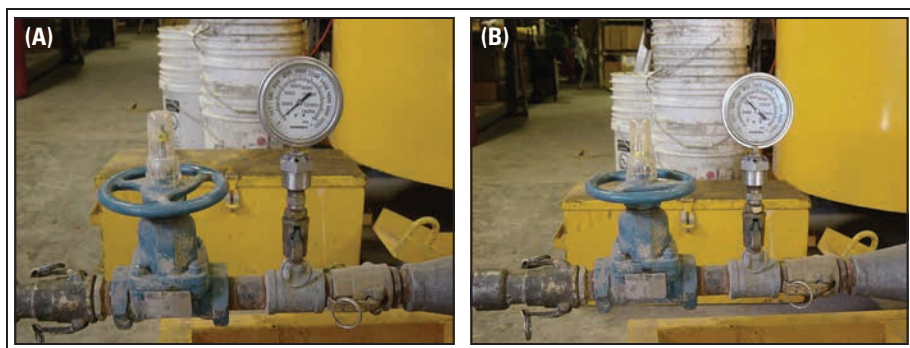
Water pressure test: (a) valve open and (b) valve closed
